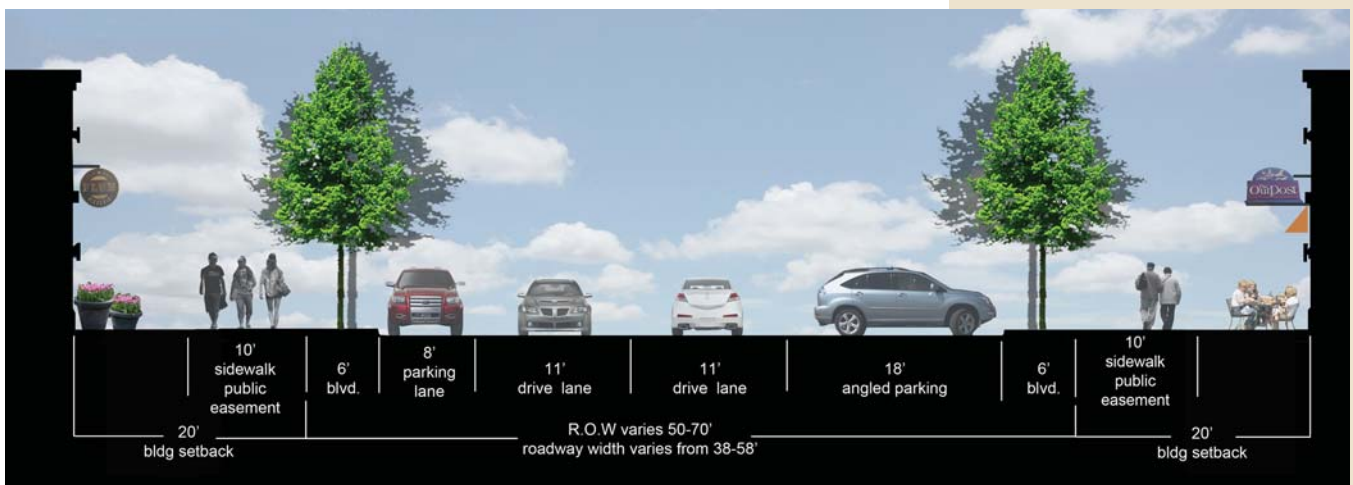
Type 3: Local and Private (W 80 1/2 Street, Morgan Avenue)
